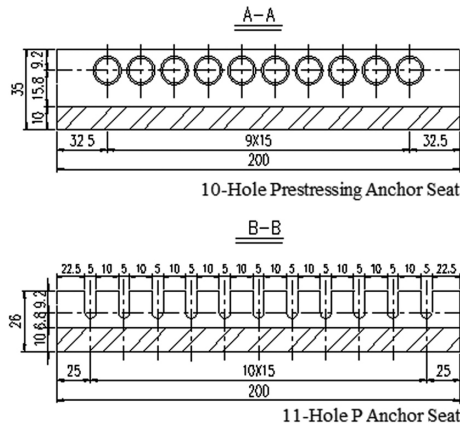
Front elevation view of Anchor 1 on the bottom of the beam (unite: mm)
